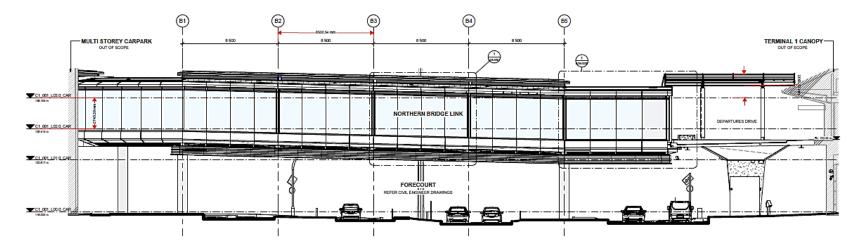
Elevation of Northern Bridge Link (top elevation approximately 130.25 metres)
